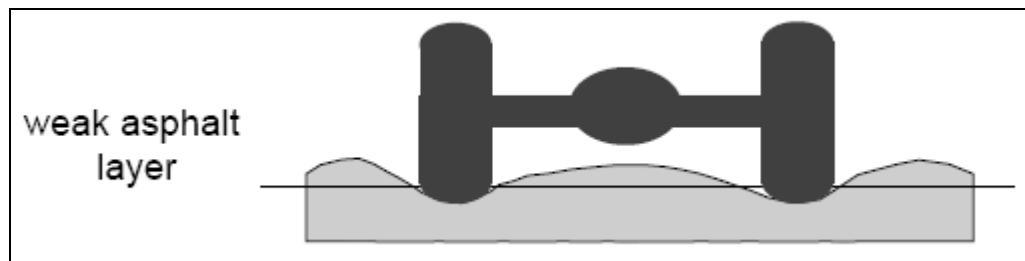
Deformation of the flexible pavement due to poor HMA design (FHWA, 1995).
